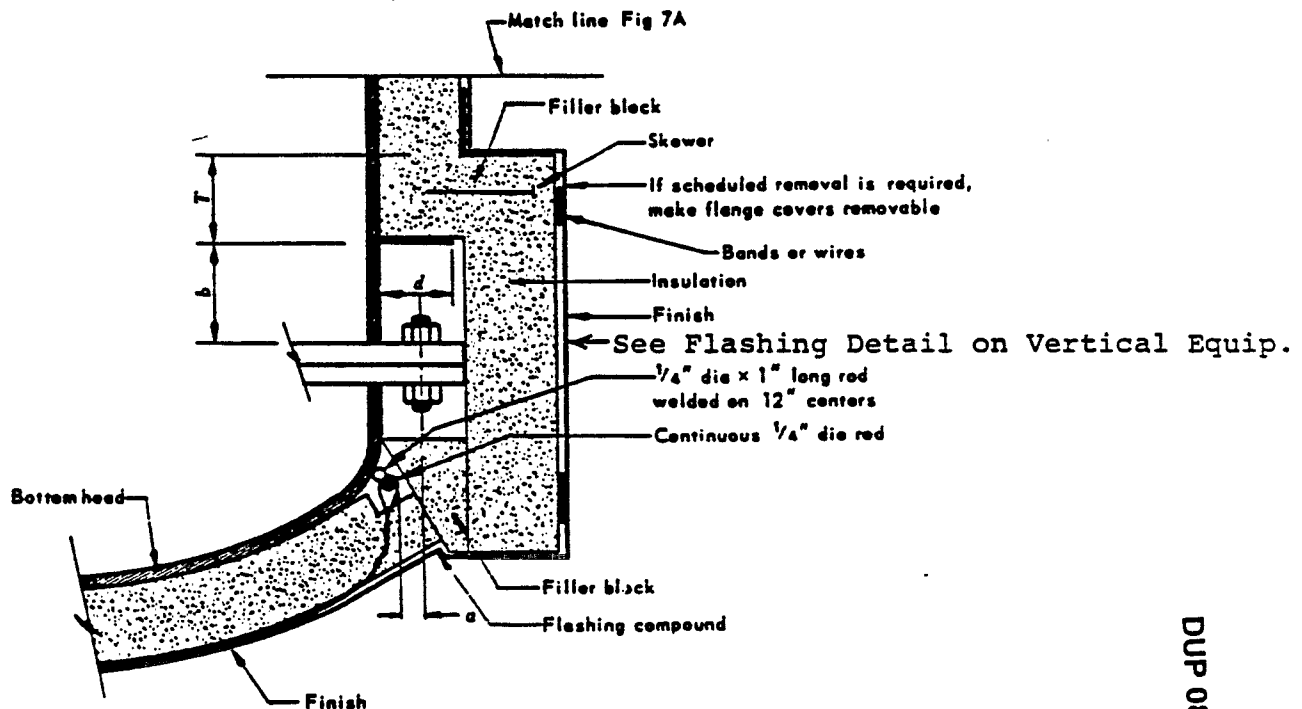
FLANGED VERTICAL EQUIPMENT
